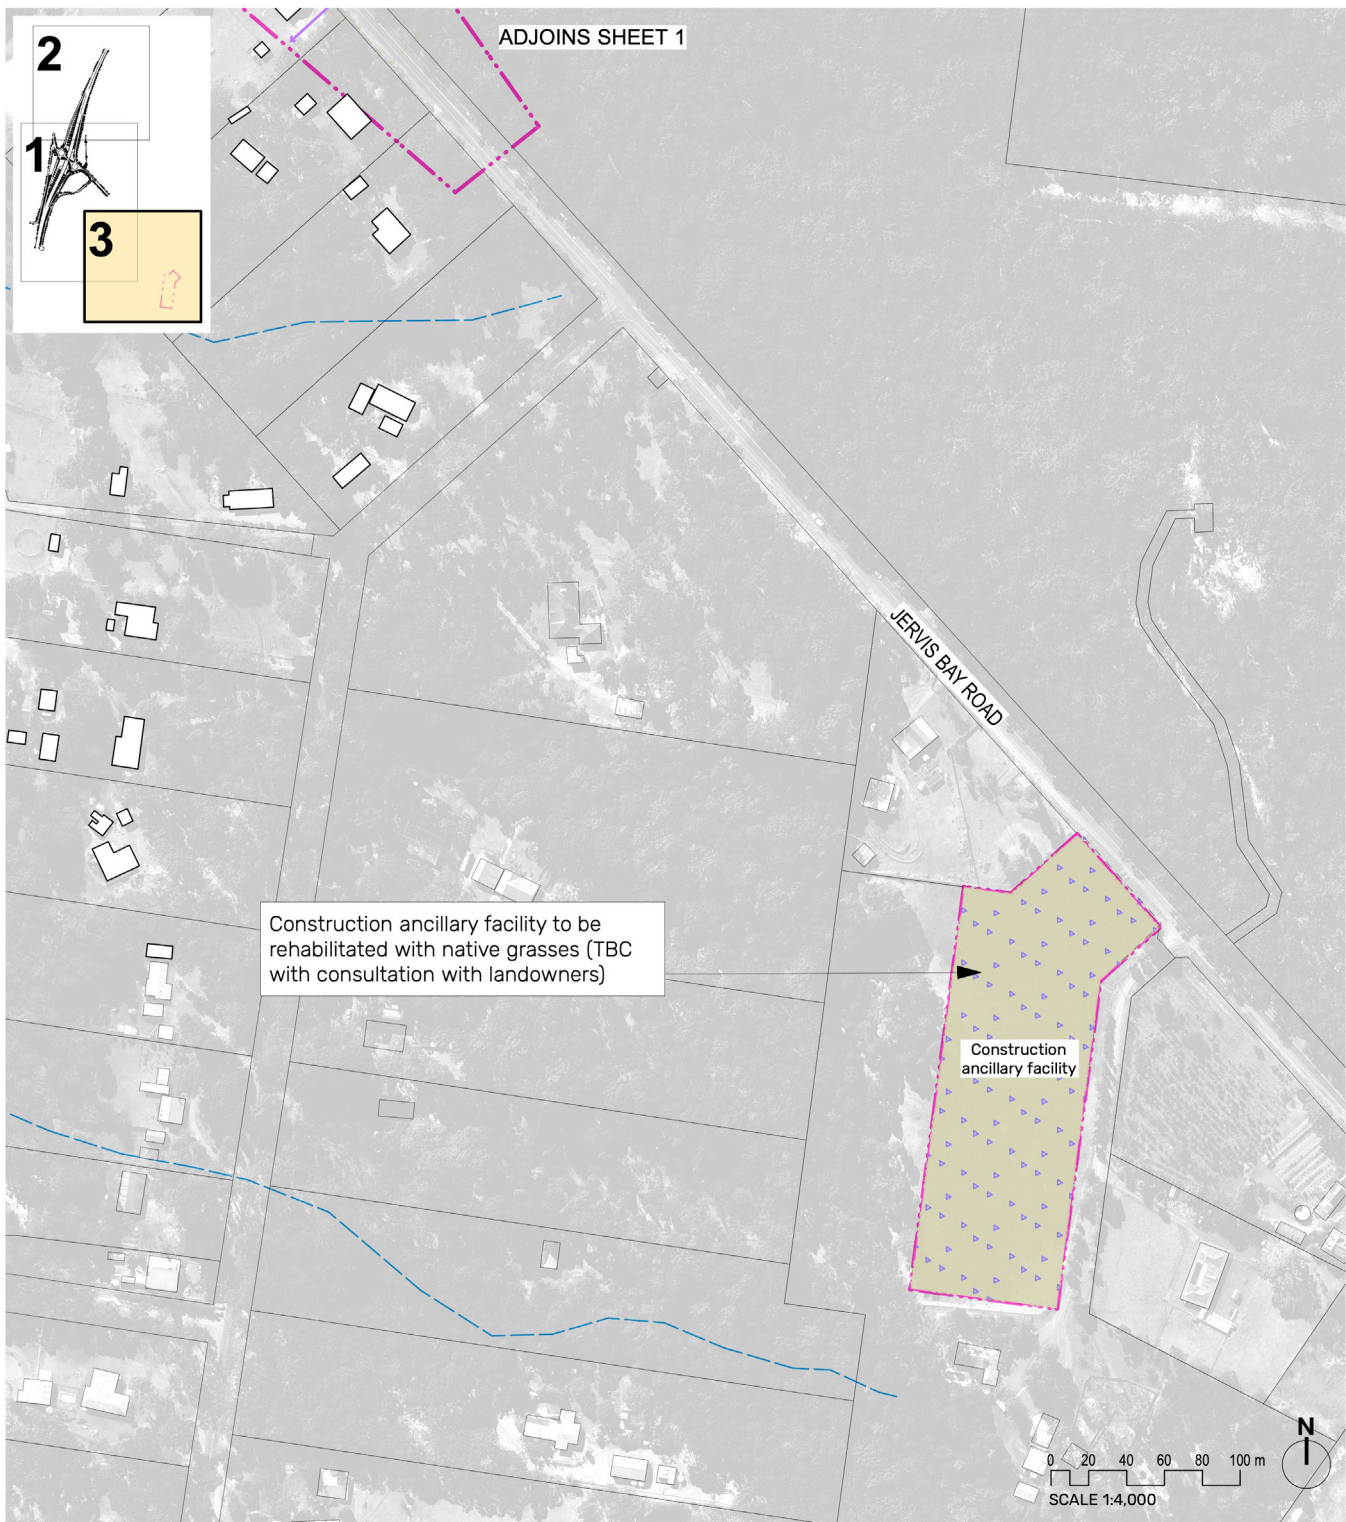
Urban Design and Landscape Strategy (Sheet 3). Diagram based on concept design only and will be refined during detailed design.
